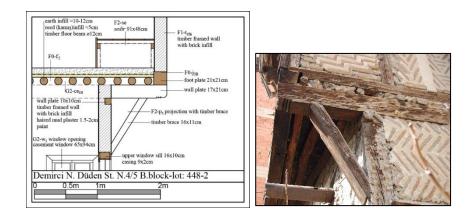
Connection detail 3, detail of use of timber framed walls in both floors in case of existence of projection (Demirci N. b.block-lot: 448-2)
